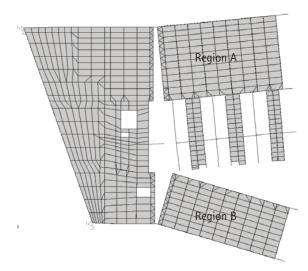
Rupture of trench headers from lateral loading leading to instability of Regions A and B of the diaphragm (deformations not to scale, failed links hidden from view for clarity)
